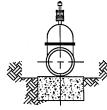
DETAIL OF BLOCK FOR 45° BEND Q - MIN. CU. YO. CONCRETE PER BLOCK NOT TO SCALE
